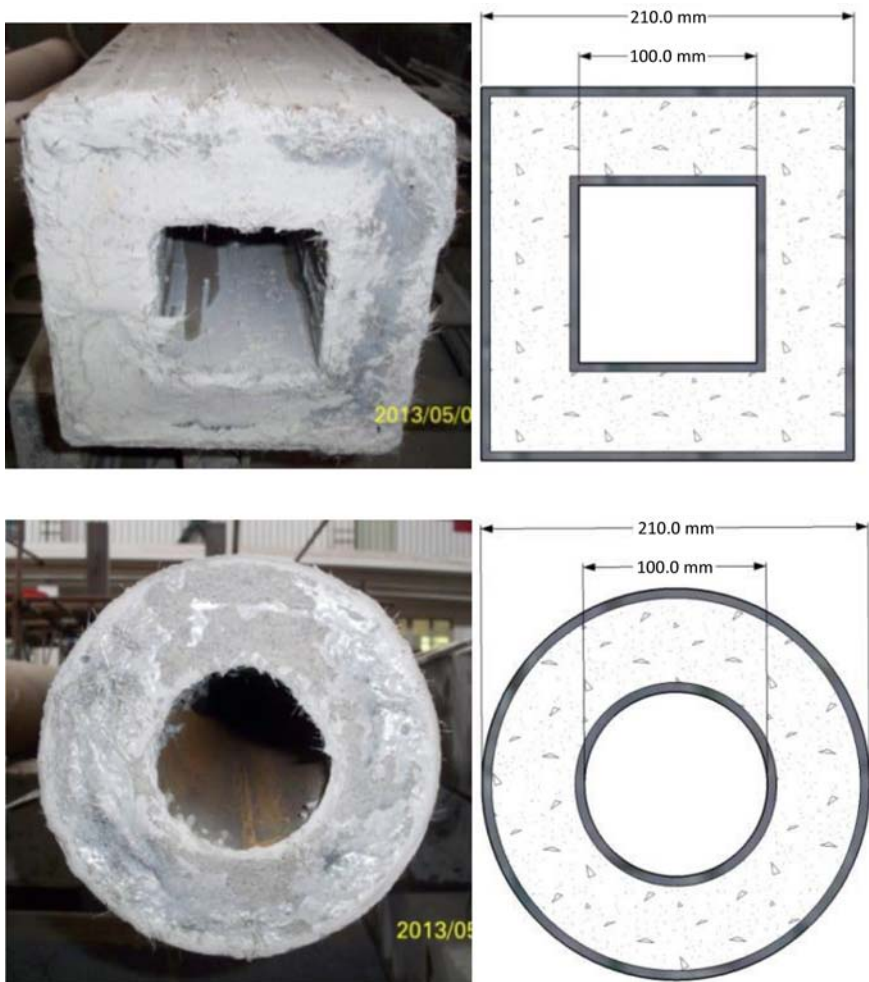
Cross-sections of a square and a circular CFDST specimen.
